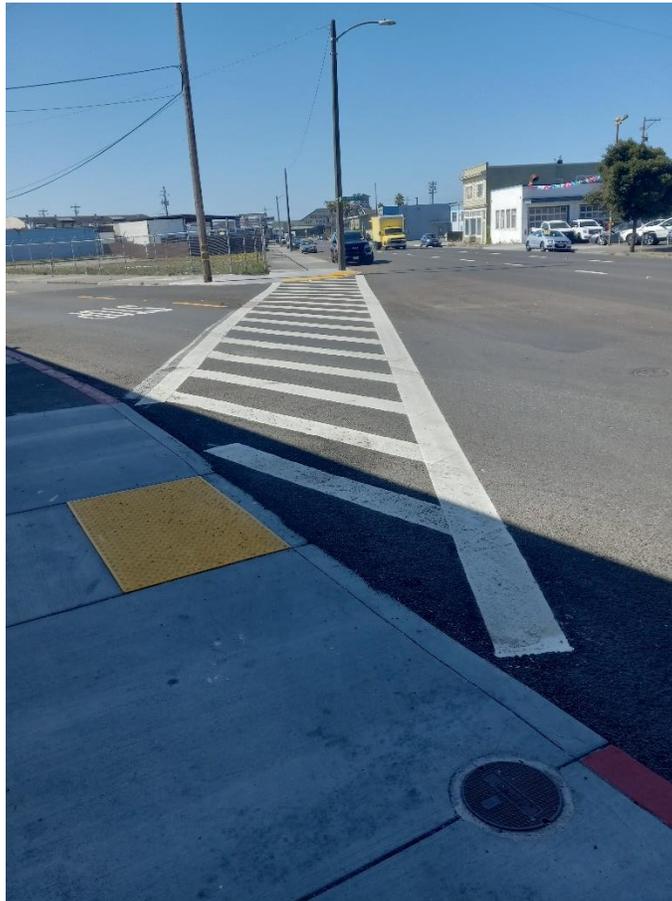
A curb ramp at 5th Street and Summer Street leads into 5th Street instead of into the crosswalk.
